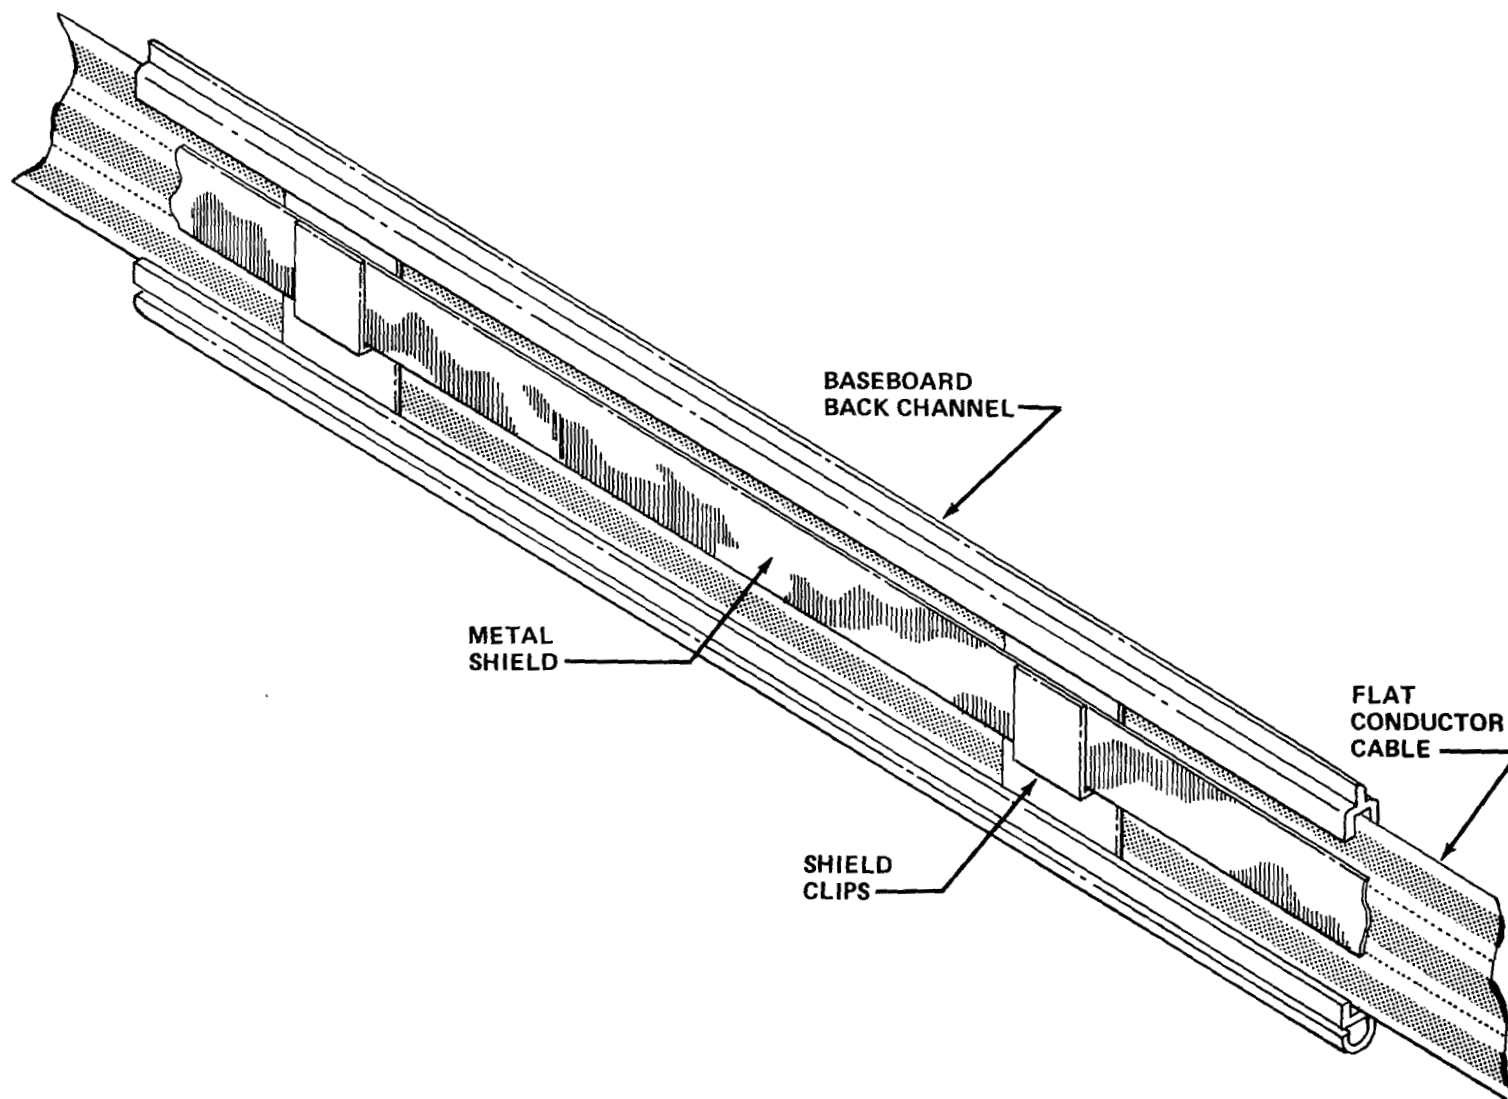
Flat conductor cable baseboard system with center conductor metal shield.
